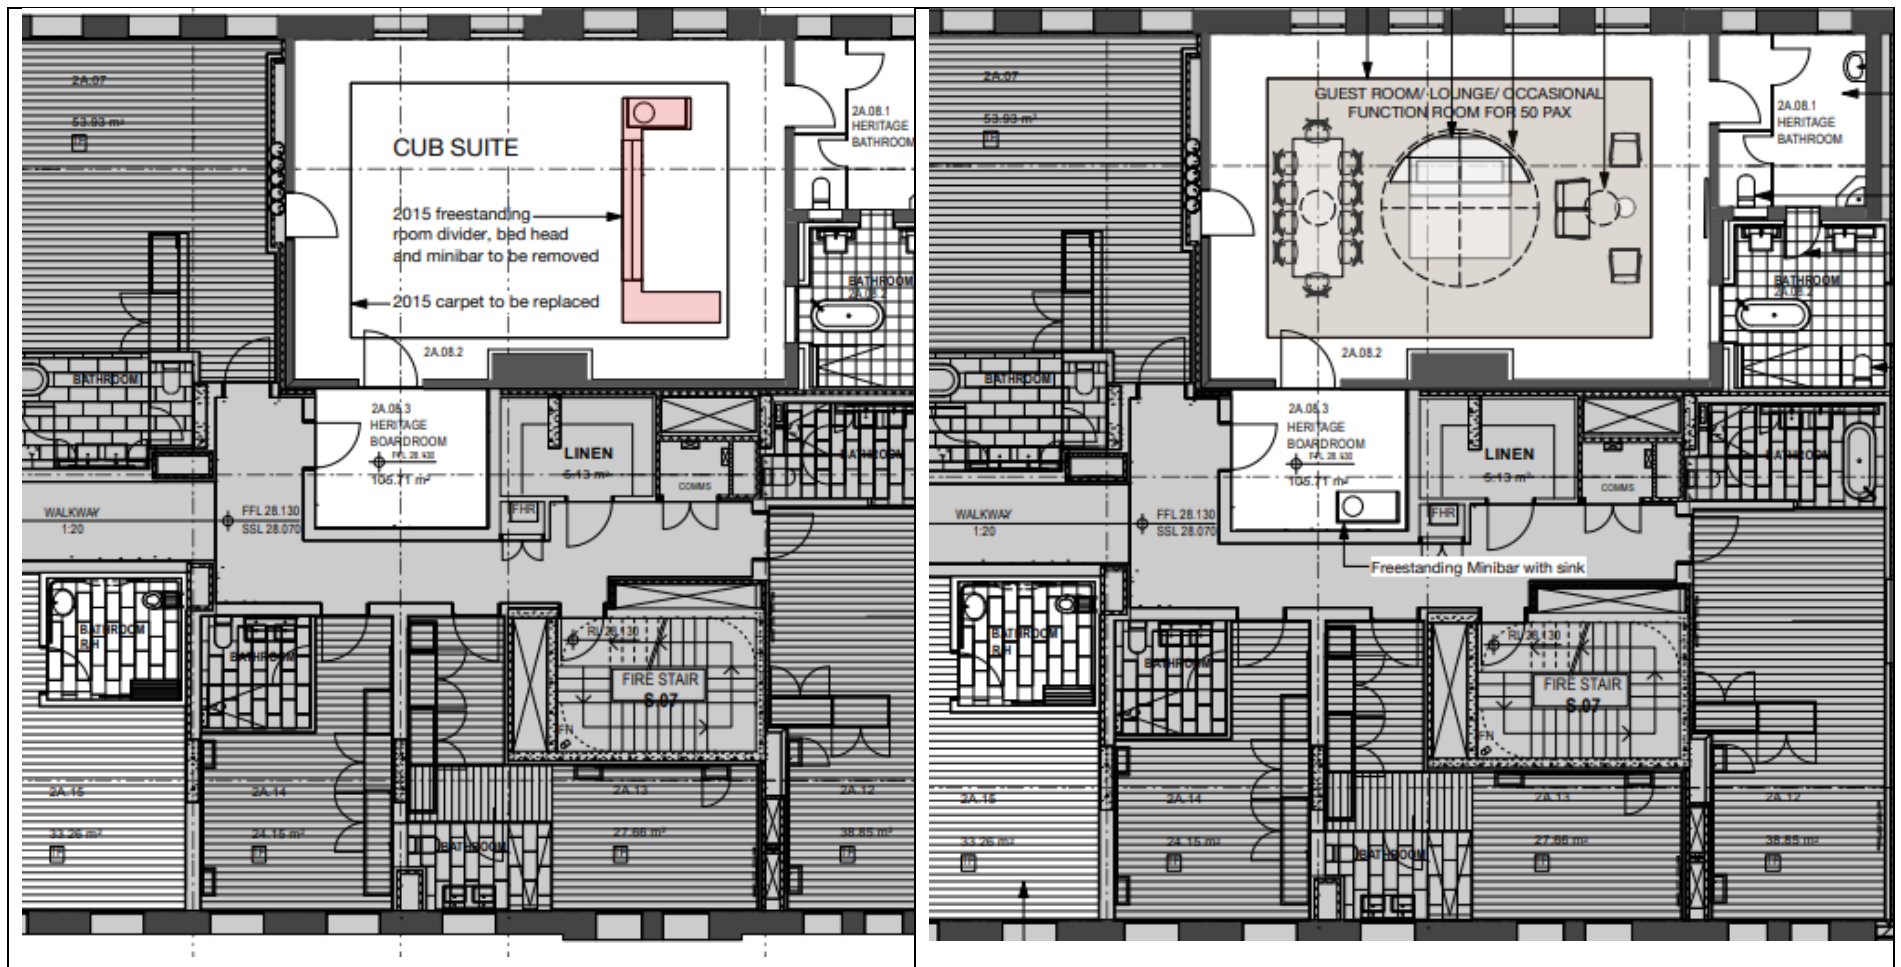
| Approved CUB Suite on Level 2 (left) and proposed conversion into guest room/ lounge/ occasional function room (right)
